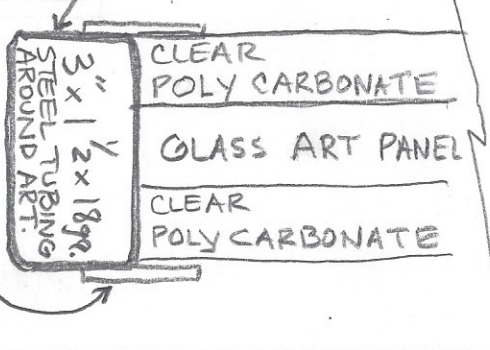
PLATE STEEL WELDED TO SECURE ART GLASS AROUND ALL EDGES.
